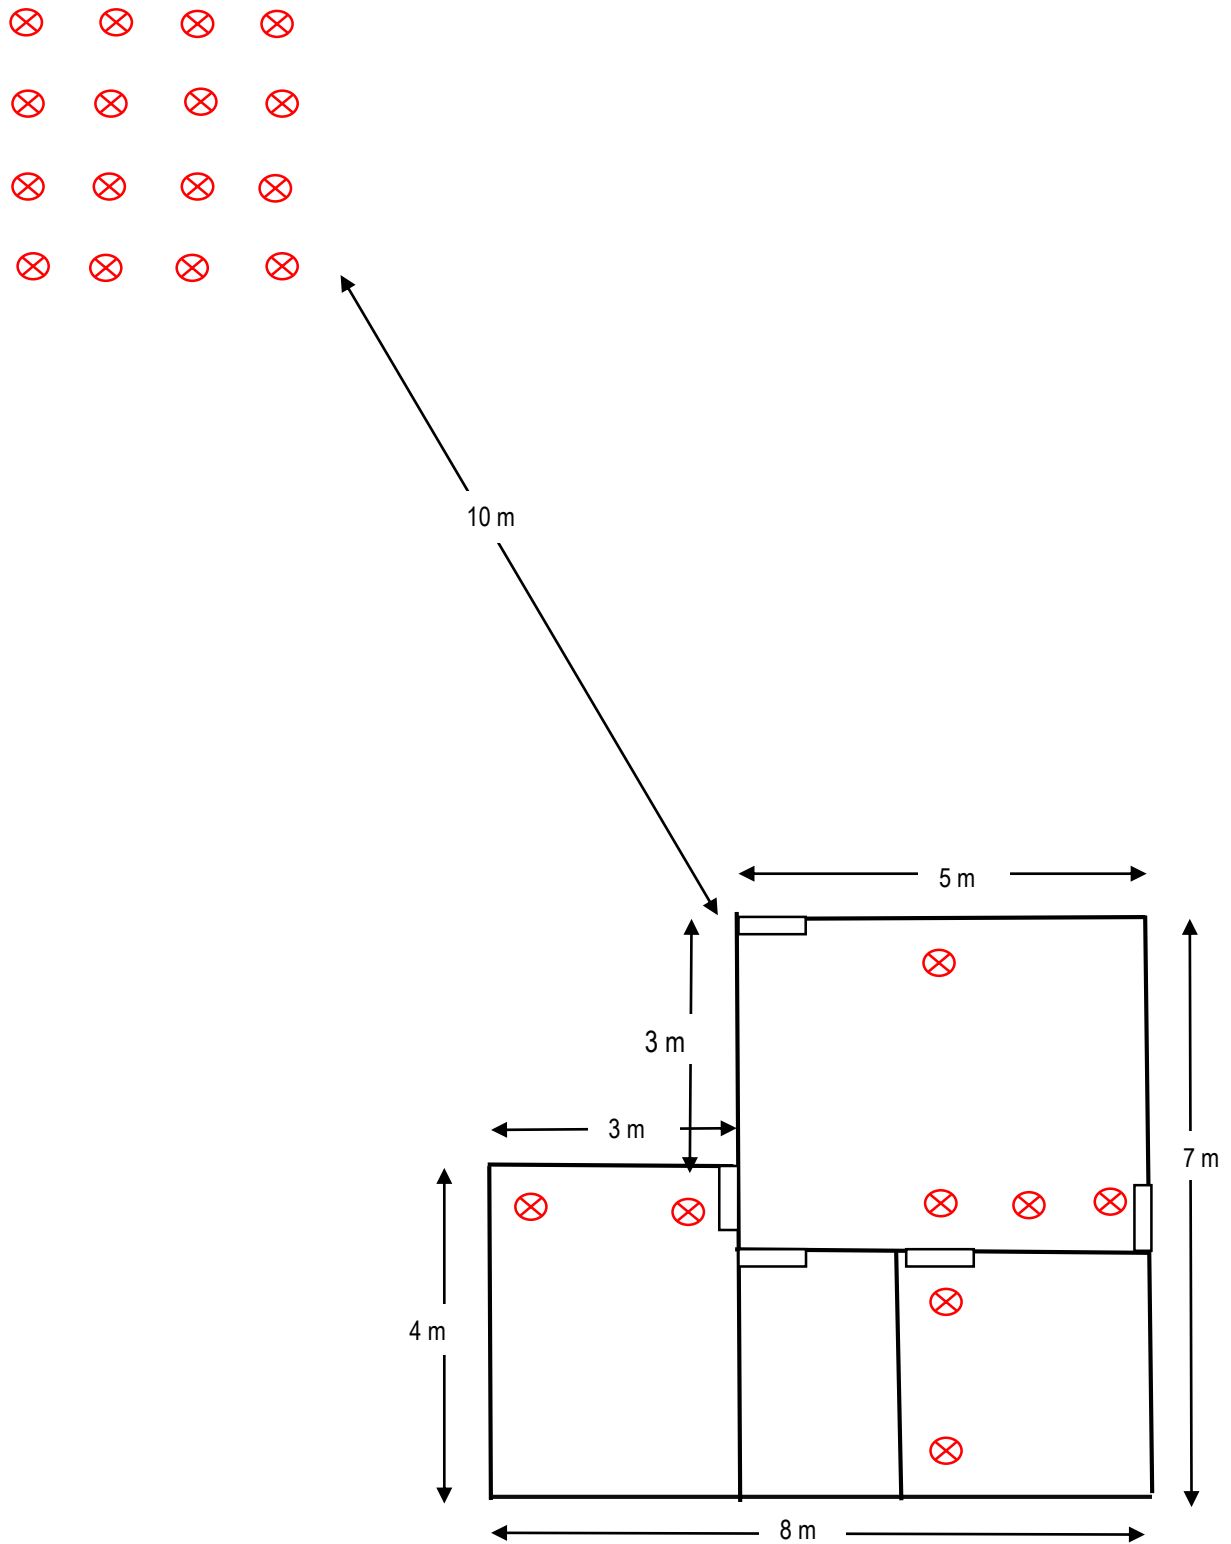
Schematic representation of the probes installed under the house concrete floor slab and the control site.
